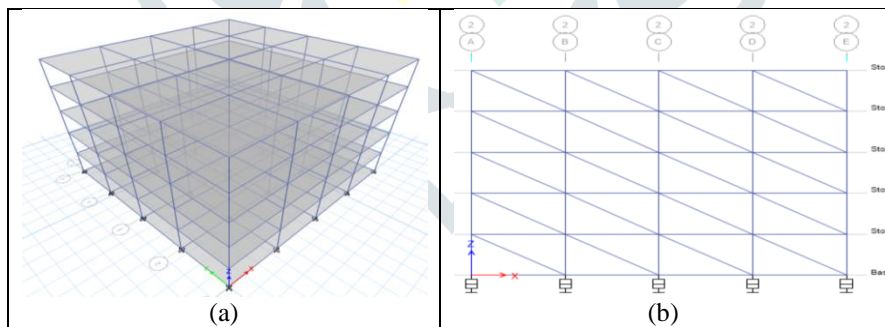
(a) Bare frame RC building (b) With Infill walls RC building for G+5
